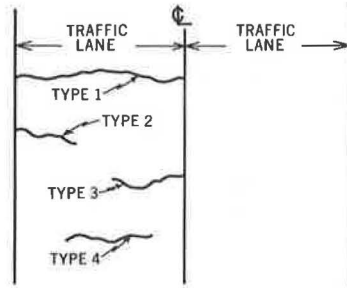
Transverse cracking (4-year old pavement made with 85- to 100-penetration asphalt).
